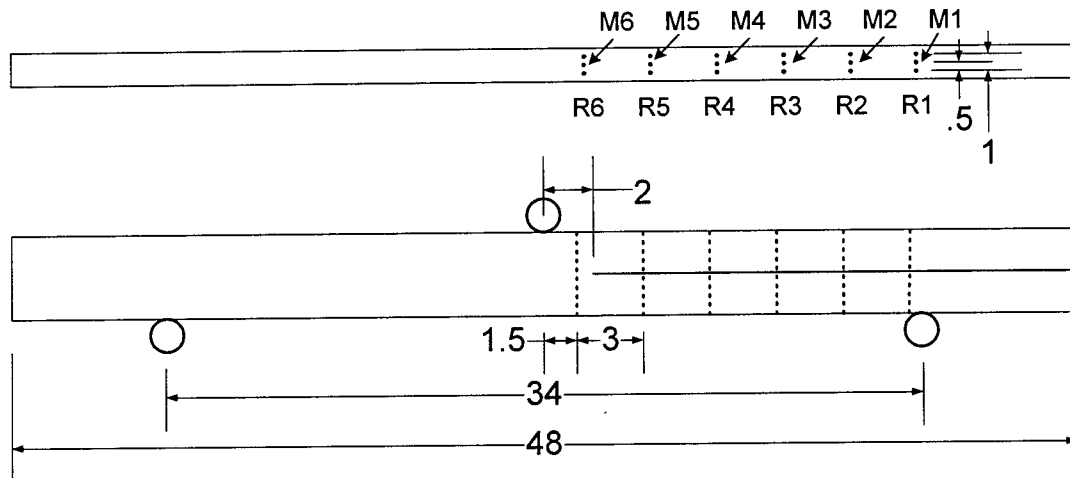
Geometry of Additional Reinforcement in 2x4 Specimens (Mid first, then Intermediate)
